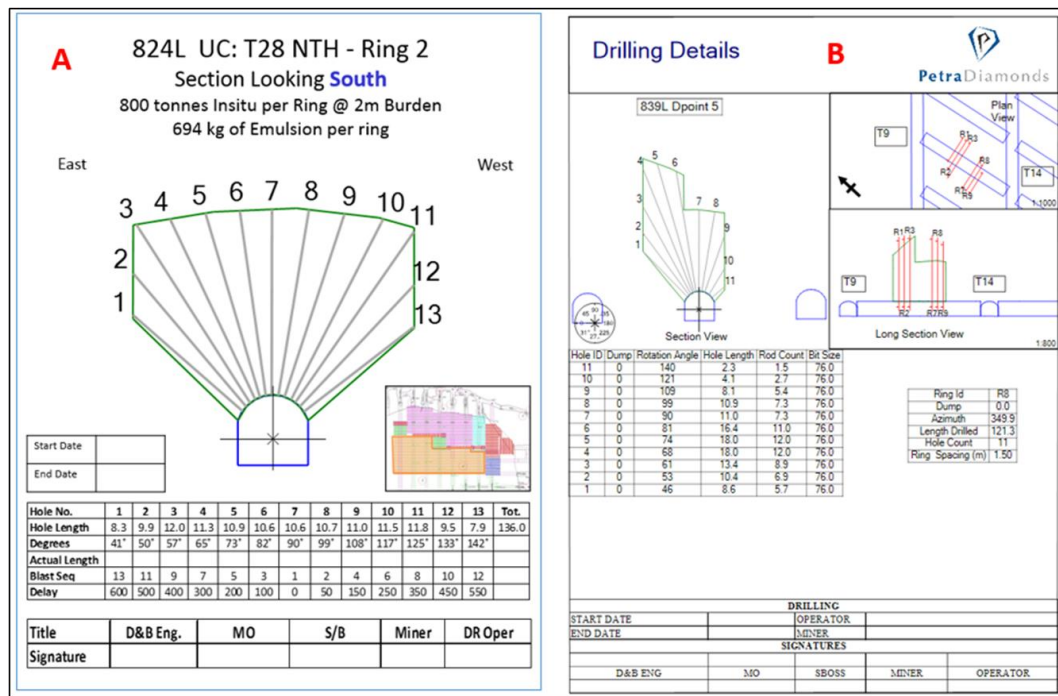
Illustrating the ring designs (a) 824L Undercut (b) 839L Extraction horizon (courtesy of the drill & balst Engineering team)
